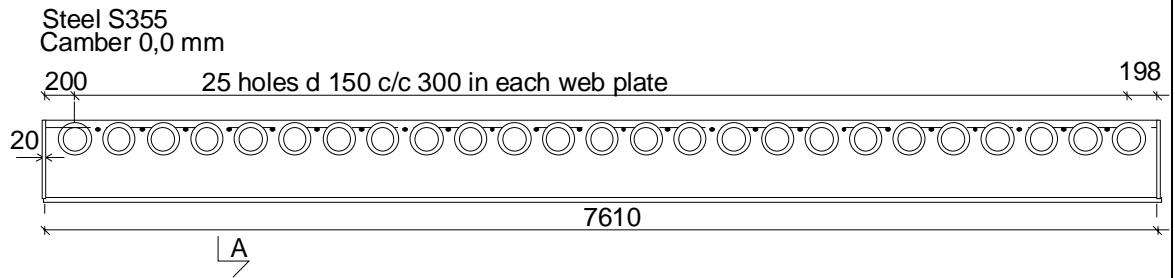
Delta beam. The beam was provided with end plates, 20 mm in thickness.
